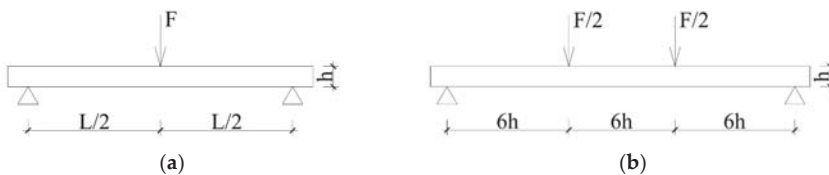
Scheme of testing: (a) small specimens Group 1, (b) small specimens Group 2 and technical scale beams, where F—load, L—span in bending, h—height of the beam.
